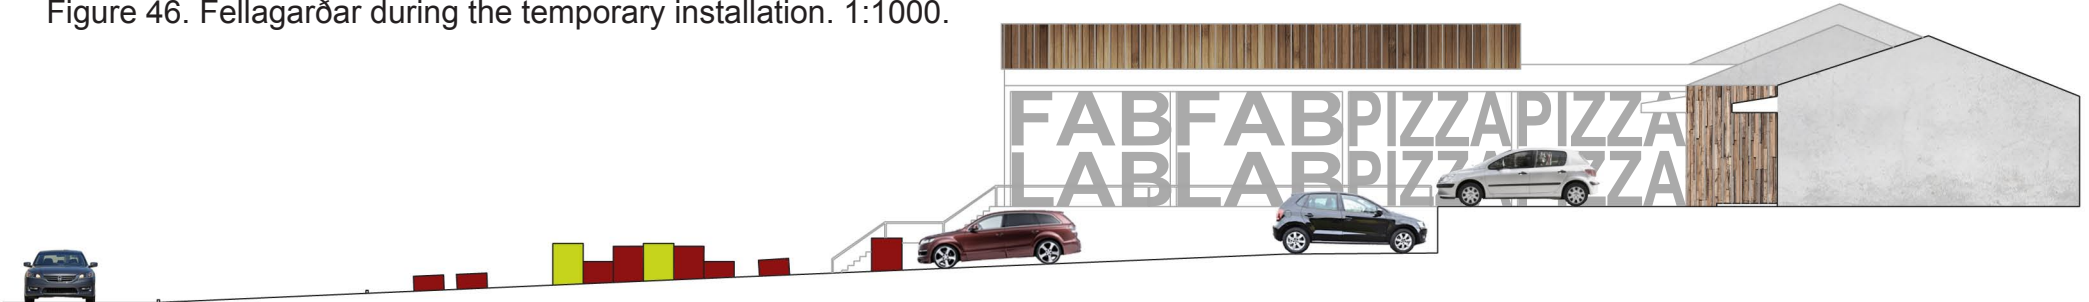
Section of the temporary installation at Fellagarðar. 1:250.
